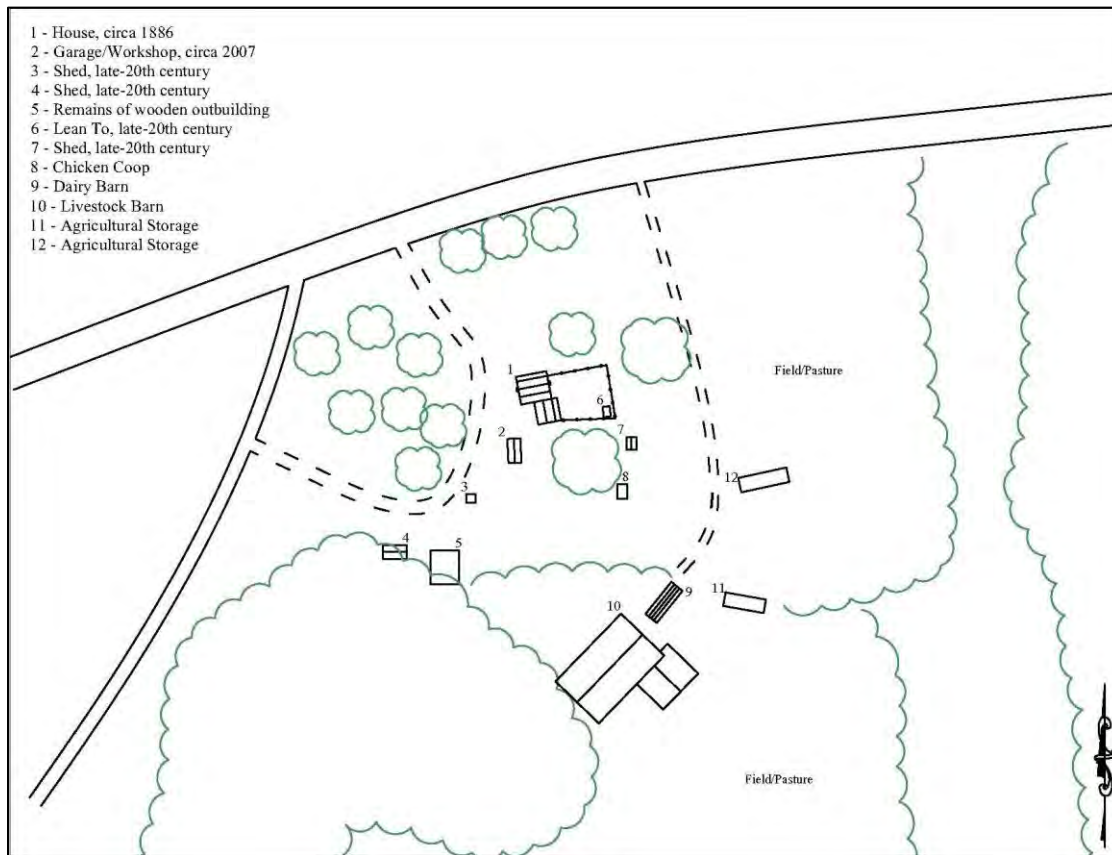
Site plan of the Small-Black House property (CA1593).
